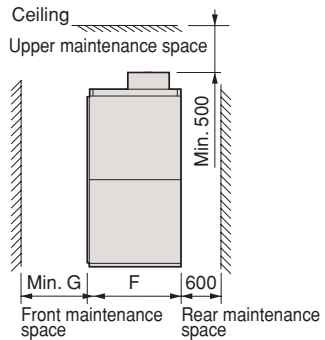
10kV: 2600, 3050, 3500, 3700, 4000, 4600, 5300kVA
